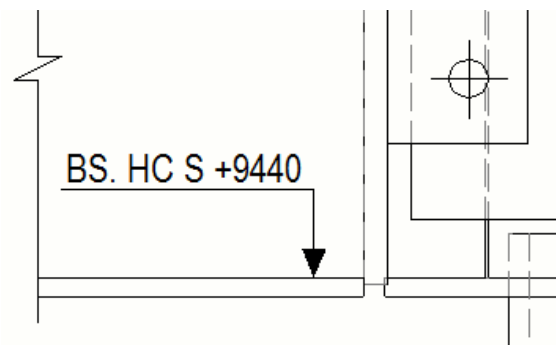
Level of bottom surface presented in a detail drawing. In this case indicating the surface level of the hollow-core slab to be installed.
